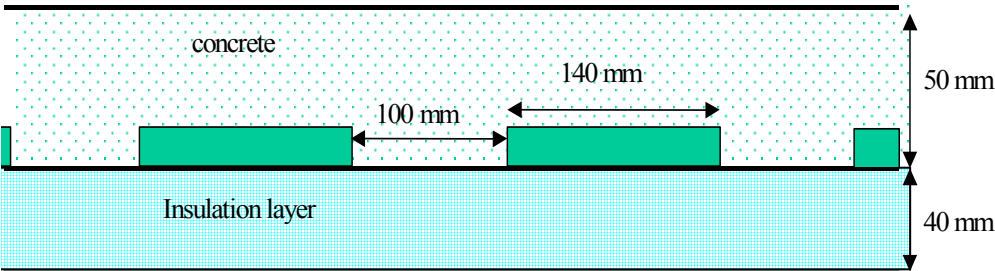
Cross-section of floor cooling with heat exchange plates in room 1.
